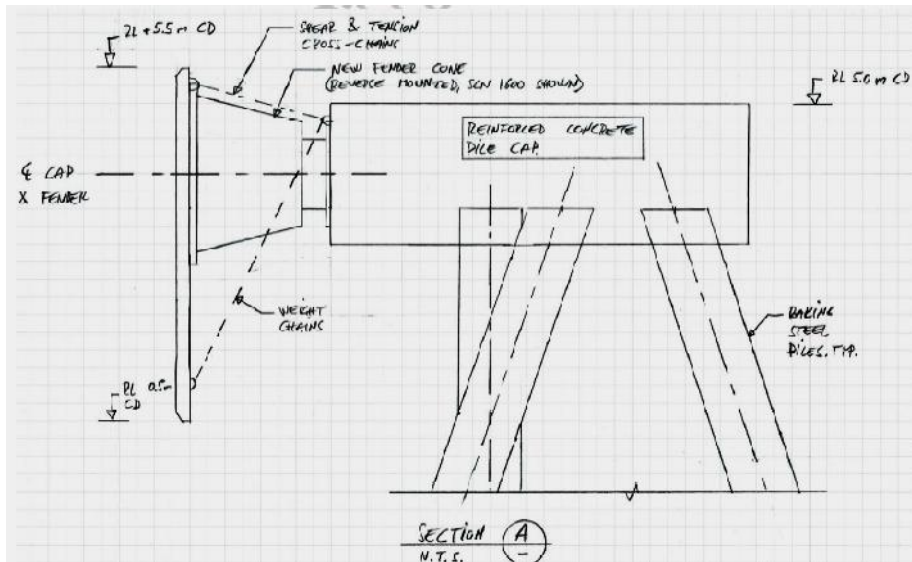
Elevation sketch of the proposed new berthing dolphins at Cairns (Source: Arup).
